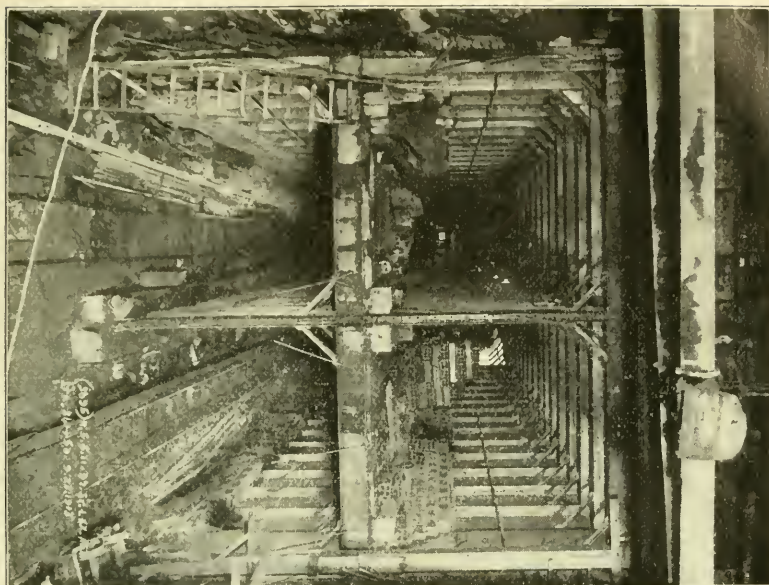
CONCRETE RETAINERS AGAINST 102D STREET TONTAL.
